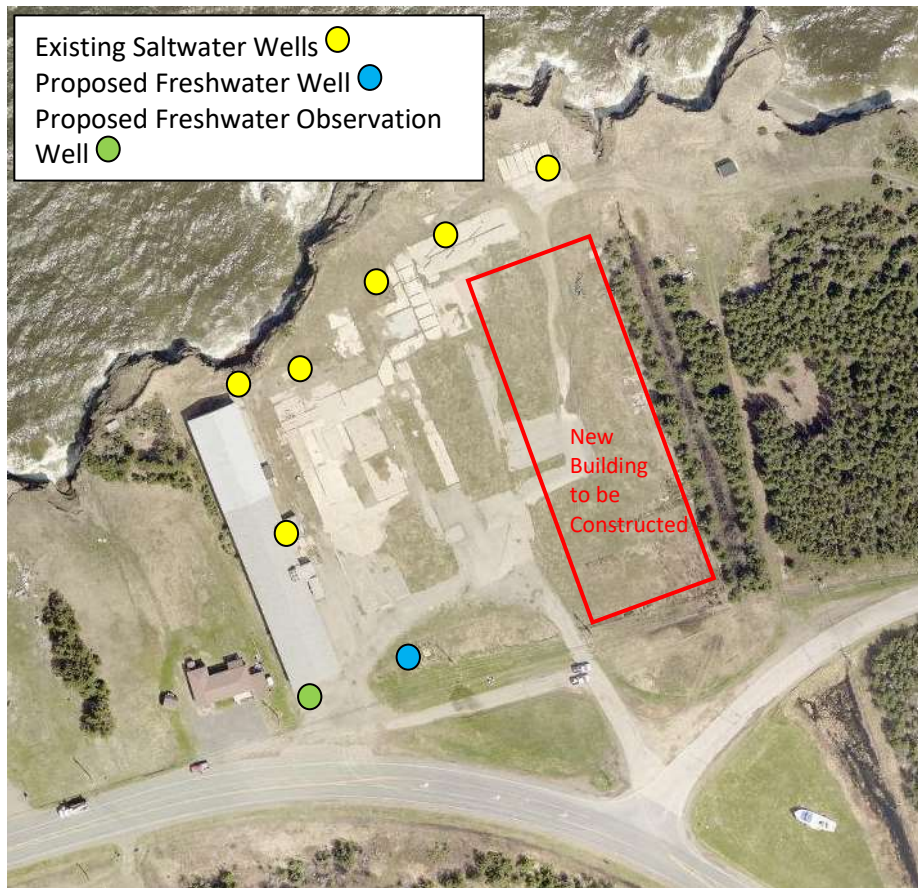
Figure C: RC Northern Organics Inc. Site Plan (Approximate)
